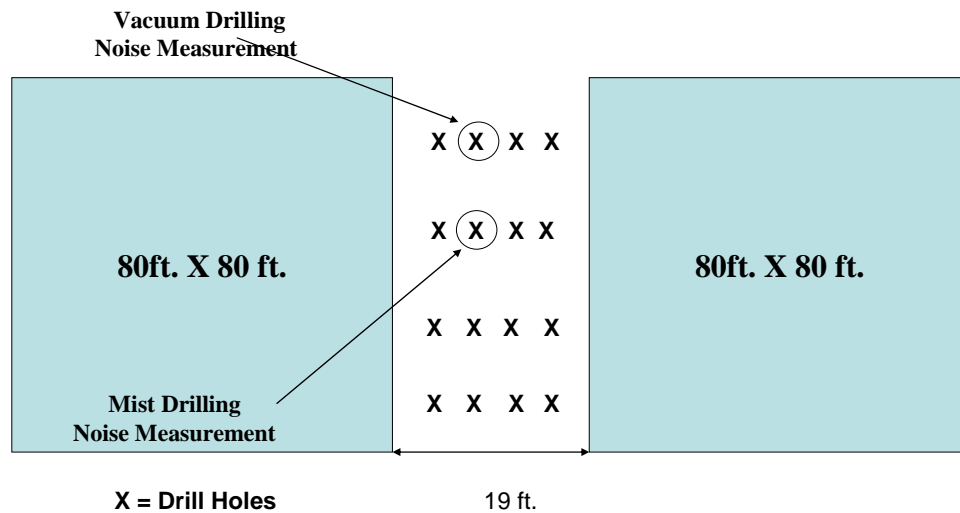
Roof Bolting Plan at the Underground Coal Mine
